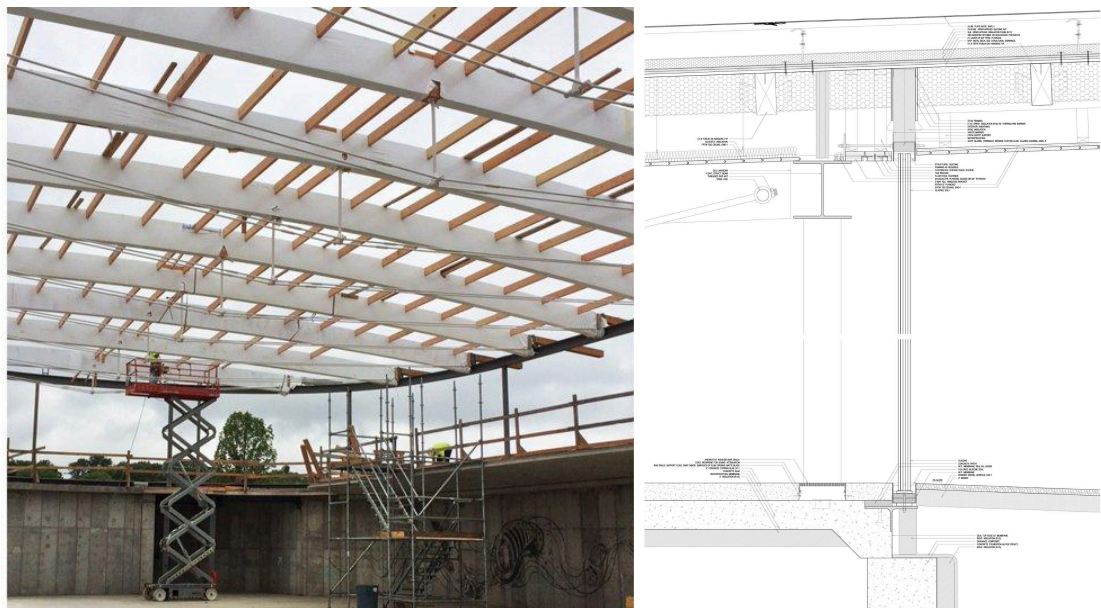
a) Construction system; b) Detail of the construction of *Grace Farms
